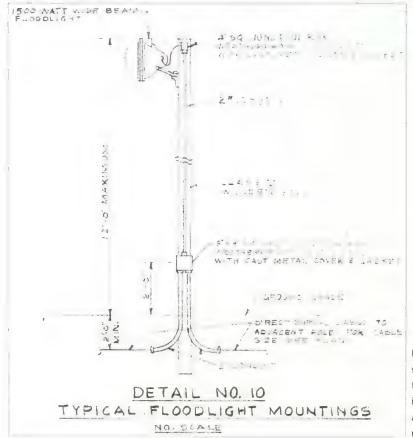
Elevation of floodlight, NIKE launch site, 1958. The poles, mounting hardware, light fixtures, and glass lenses should be routinely inspected. Any deficiencies should be corrected and damage components should be replaced to match the existing (GATE 11056).
